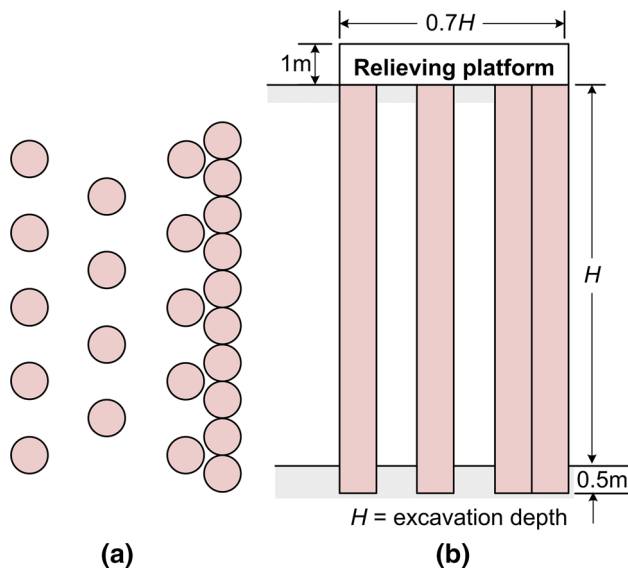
Typical DCM wall a plan view, b section view
